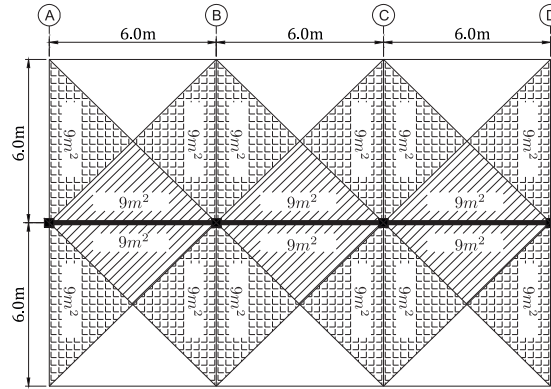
Typical plan of low- and medium-rise RC frames.
